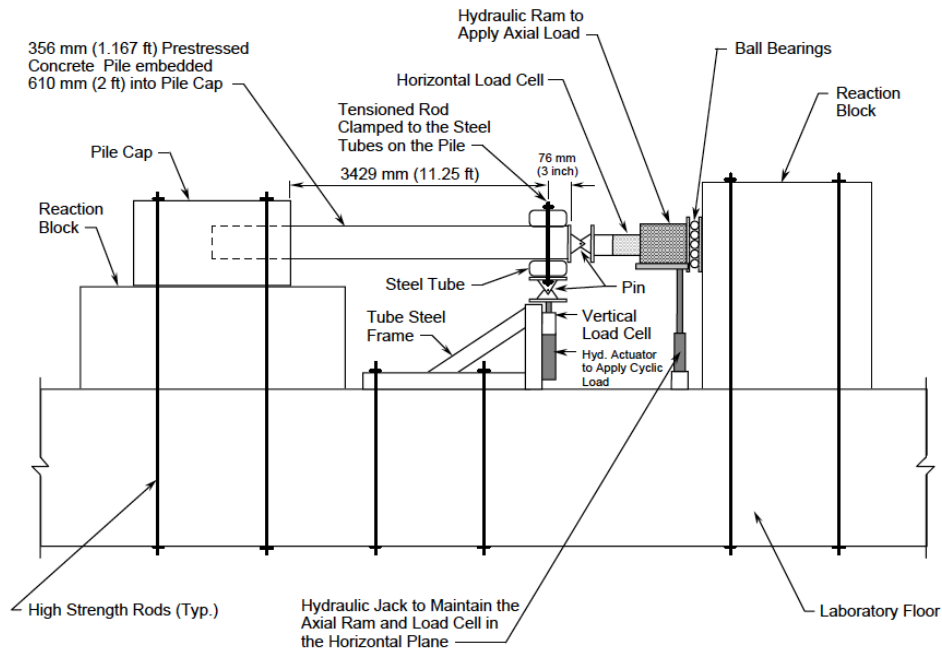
Schematic of prestressed concrete piles test setup (Tabatabai, Oesterle and Lawson 1999).
